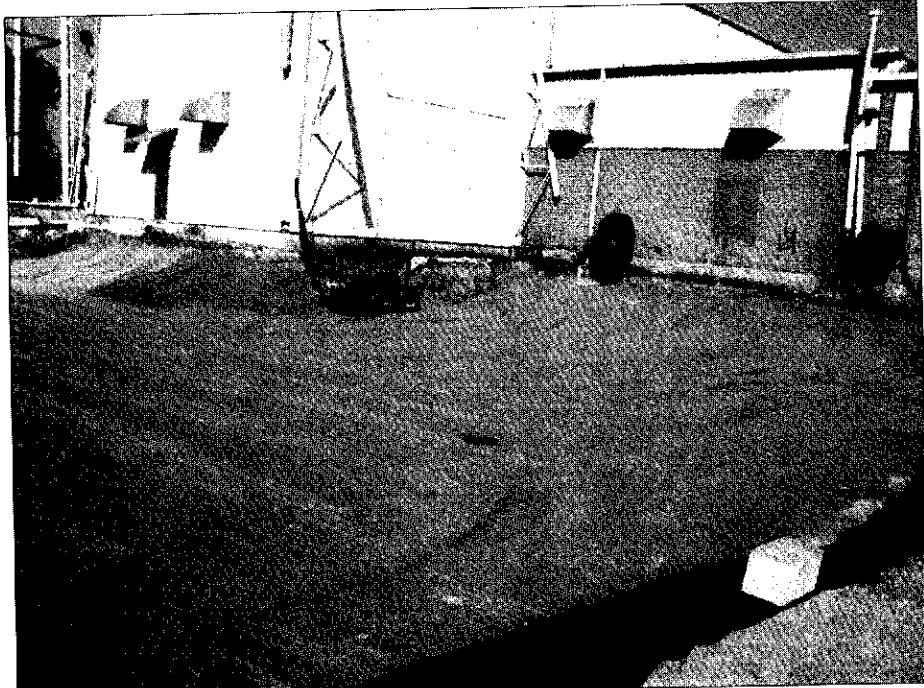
COMPLETED EXCAVATION WITH FIRST LIFT OF BACKFILL
